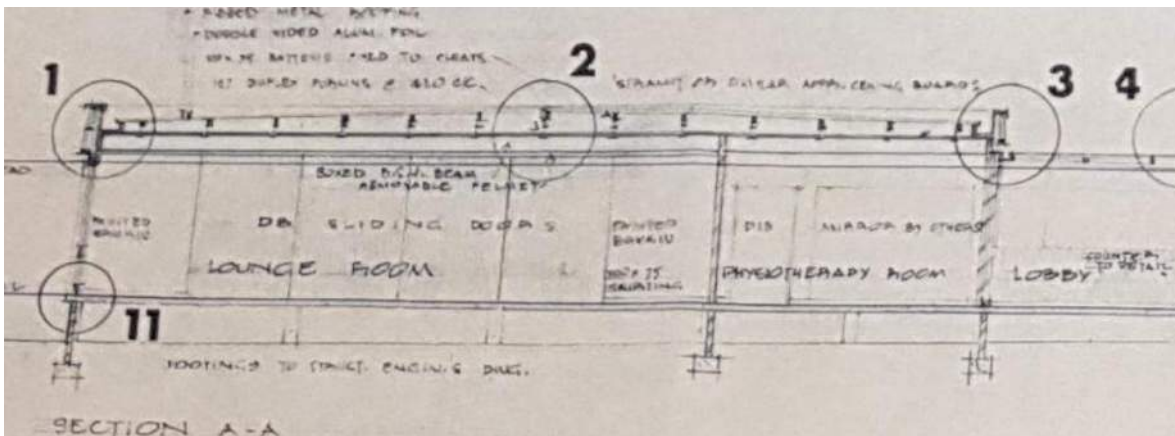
Existing architectural drawing showing section through building.
